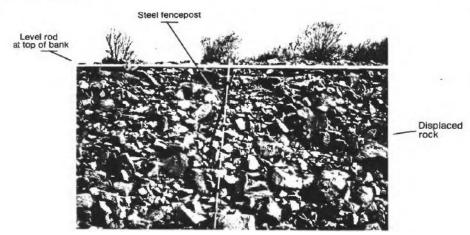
Site E-10 over Sacramento River Riprap Failure (Blodget & McConaughy, 1986).
